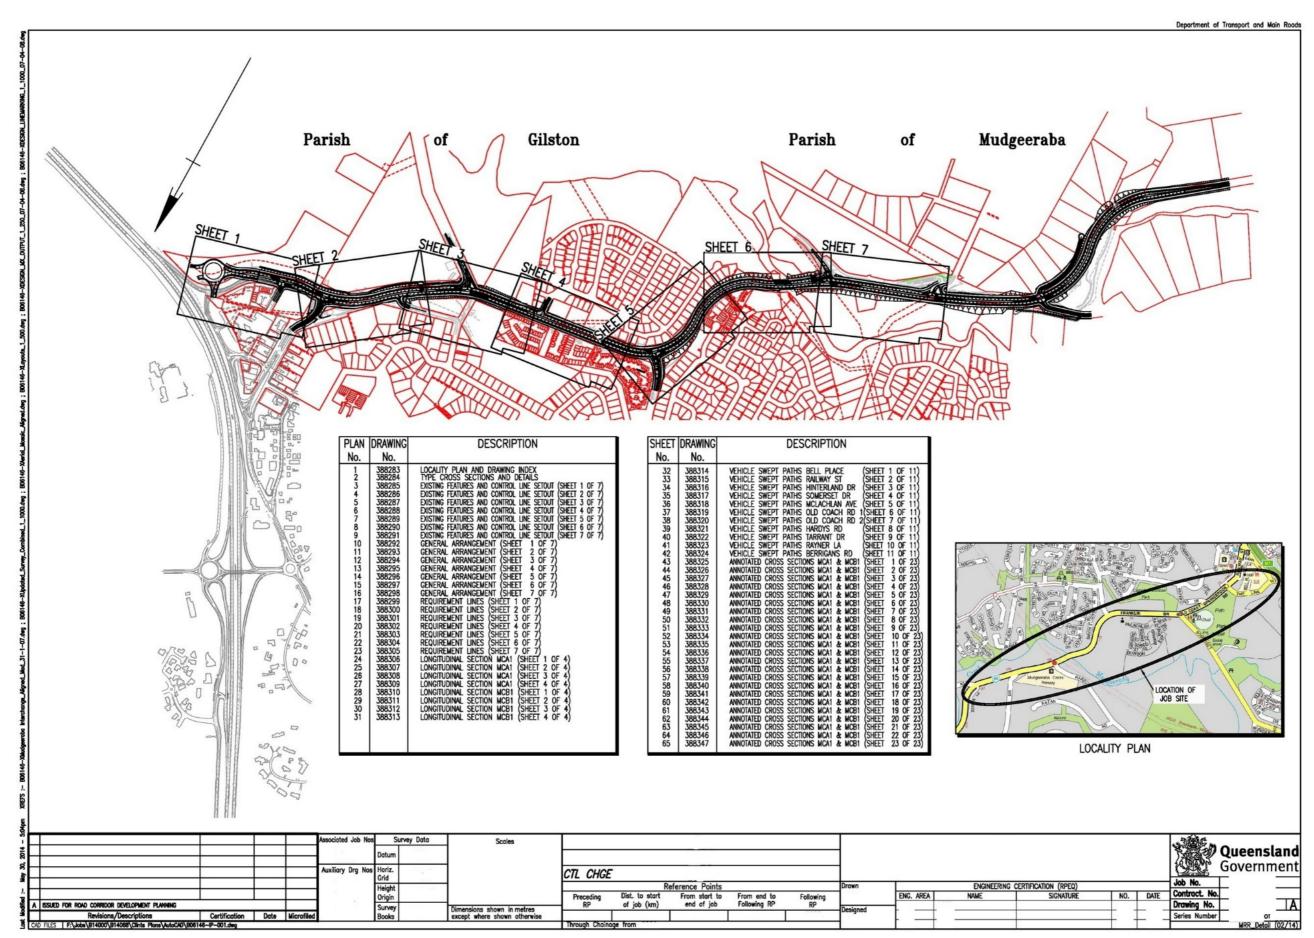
(b) – Locality plan and drawing list – registered example 1
